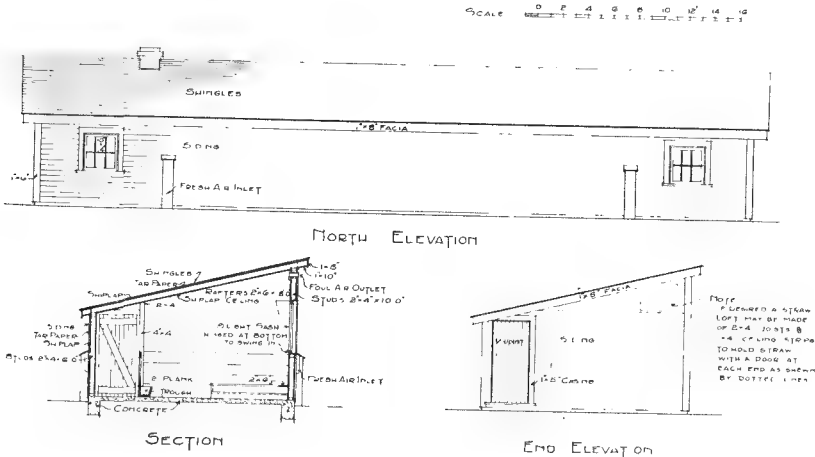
A one story shed-roof building with five pens and a feed room, inexpensive to build, but very serviceable.
